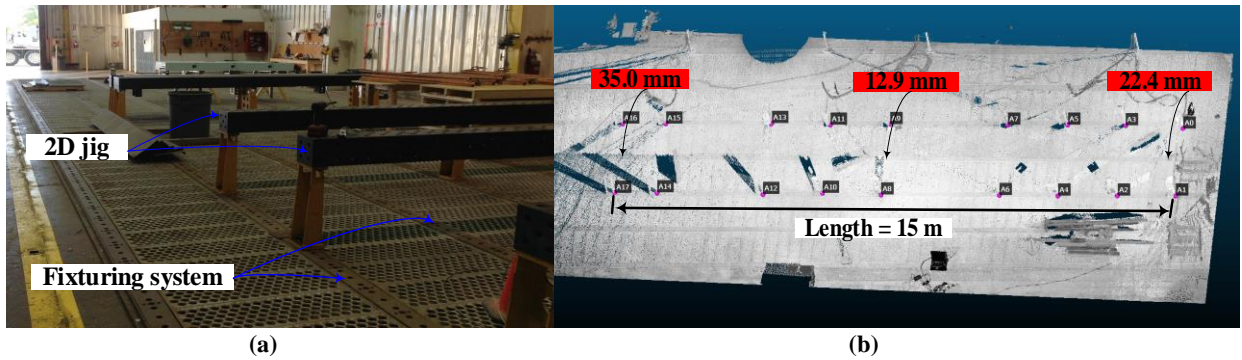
Framing table at fabrication shop: (a) 2D jig and fixturing system, (b) deviation analysis results of the fixturing system.
